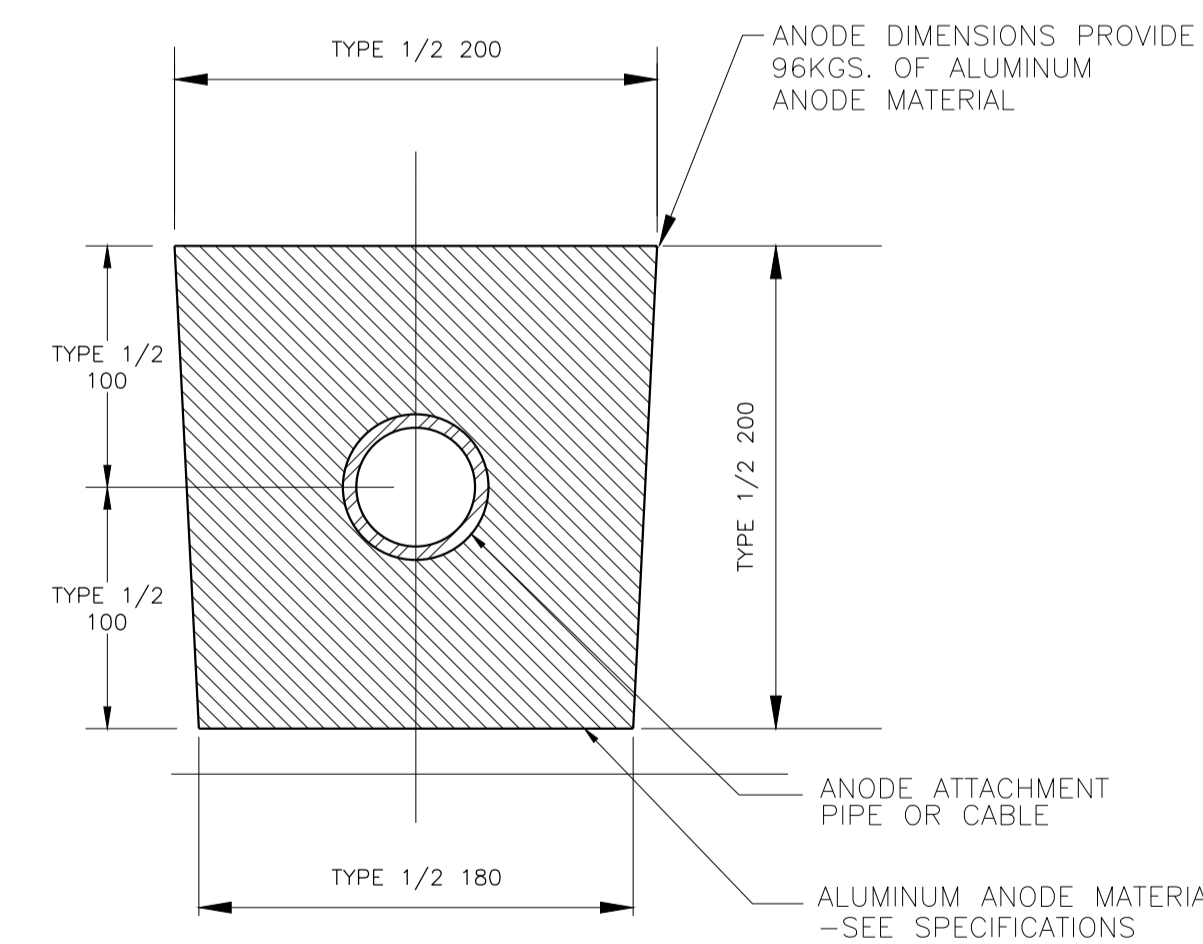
TYPE 1 ALUMINUM ANODE DETAILS
